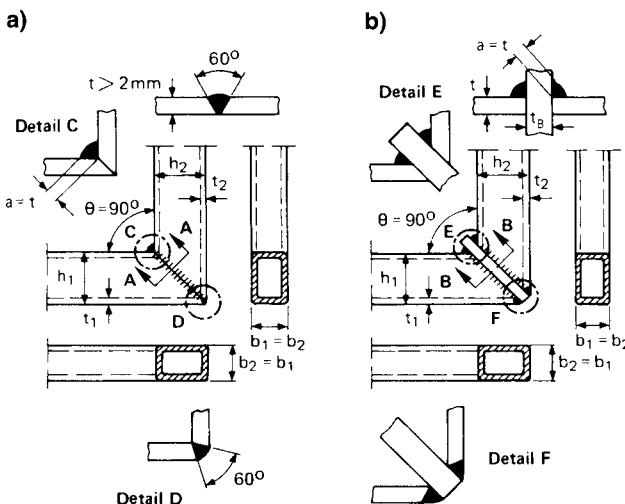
Knee joints a) without stiffeners b) with stiffening plate
